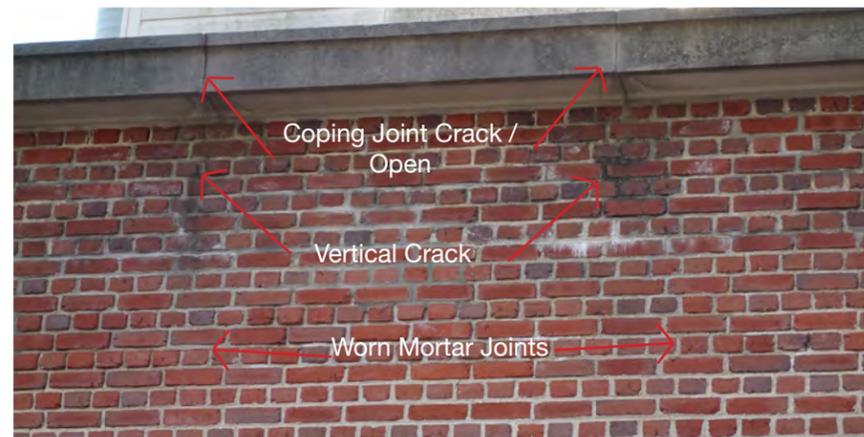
20 East Facade - Coping Stone Open Joints, Cracks, Worn Joints
